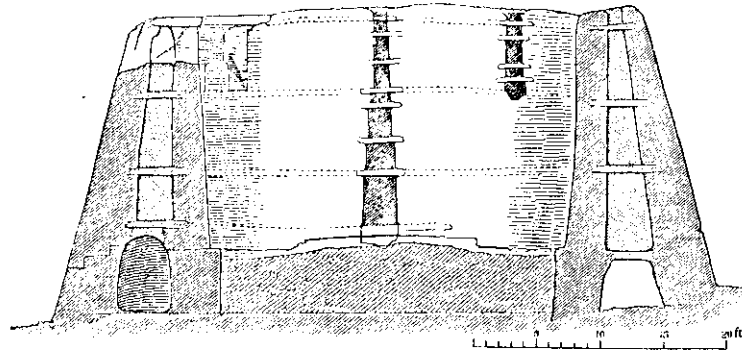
Section of the elevation of Broch in Glenbeg, near Glenelg. (From Plan by Sir H. Dryden.)
